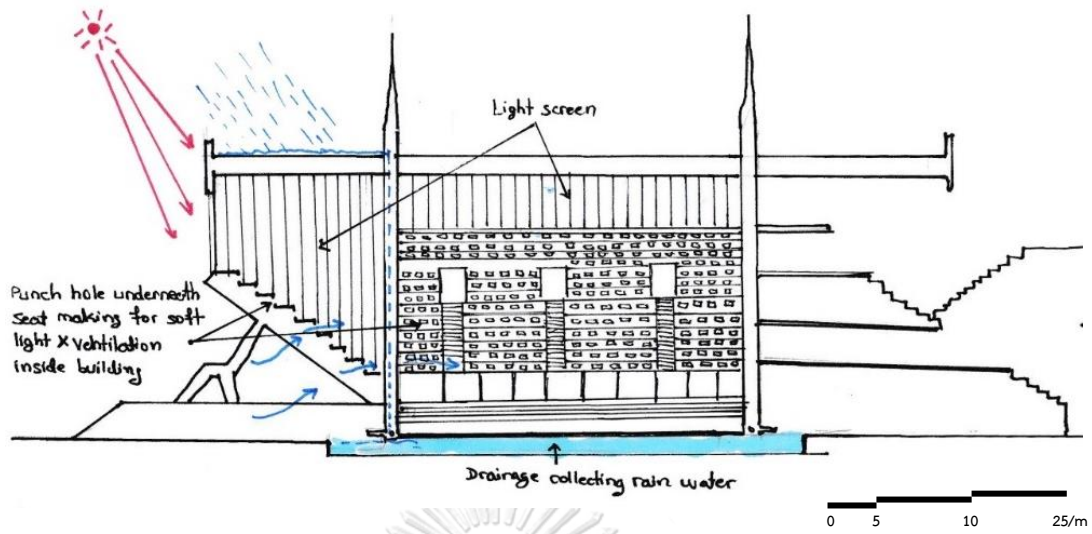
20 Section drawing of a slanted wall as the wall and audience's seats
